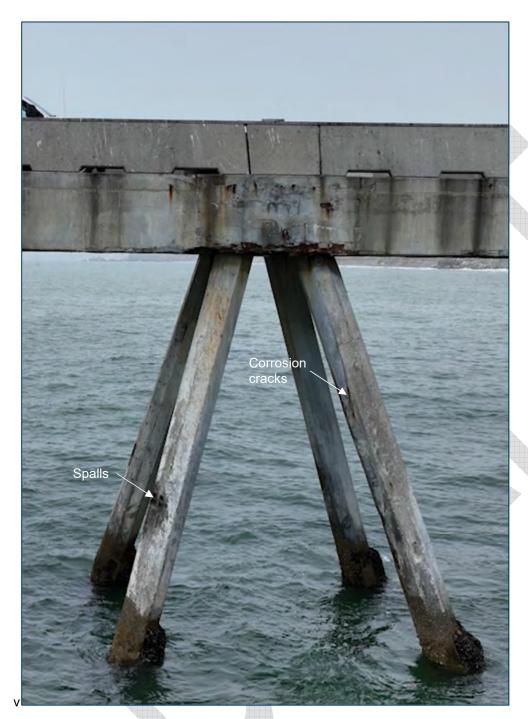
Deck Exterior at Bent 1P - South Face
